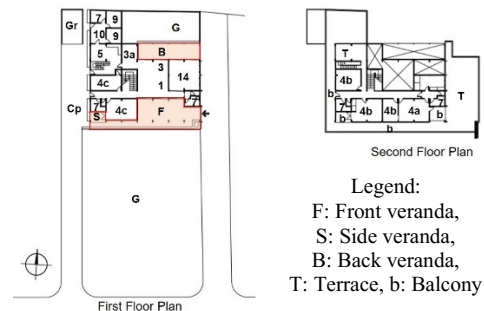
Plan of House of T.D. Pardede (1960)⁴⁾
